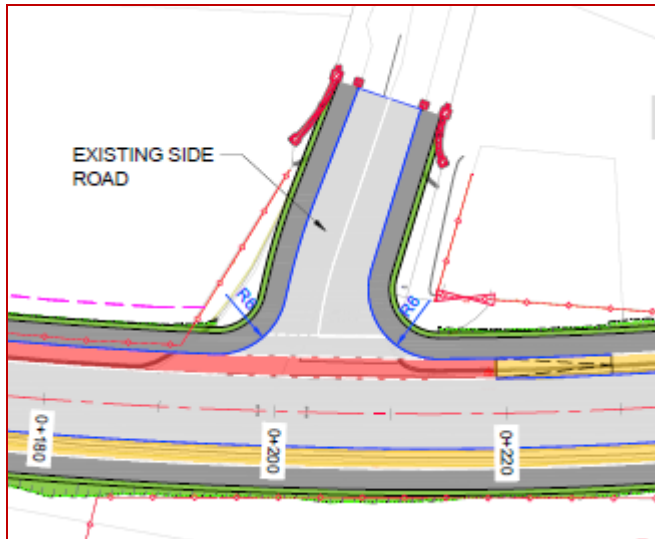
Typical Layout of One-Way Cycle Facility Crossing at Priority Junction
